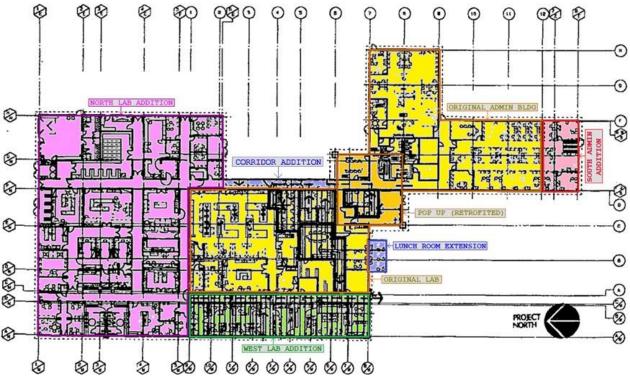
Admin/Lab Buildings - Plan View Showing the Building Parts
